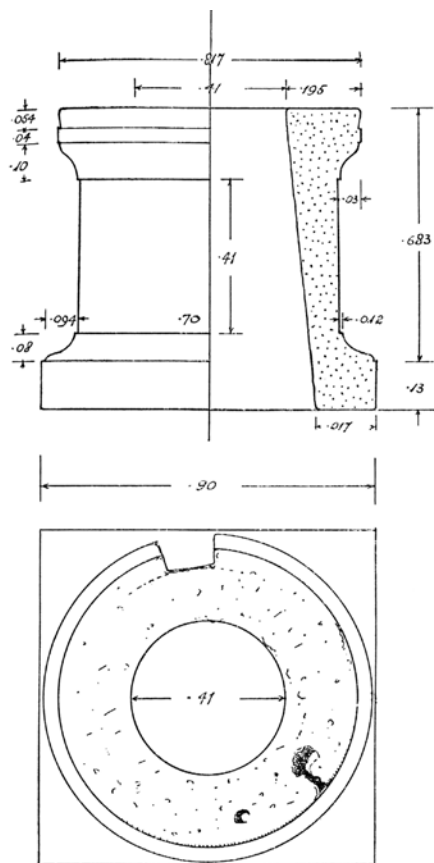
Profile, section and plan of the well kerb in Shop XIV, Corinth 1.4, fig. 39.
